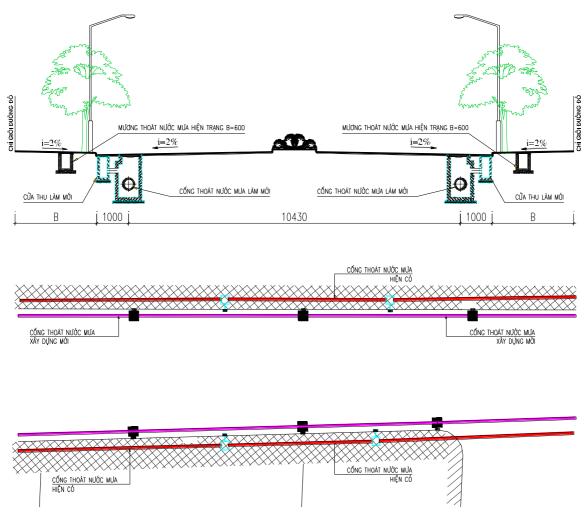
Typical Cross Section of Technical Infrastructure on Nguyen Luong Bang Road
